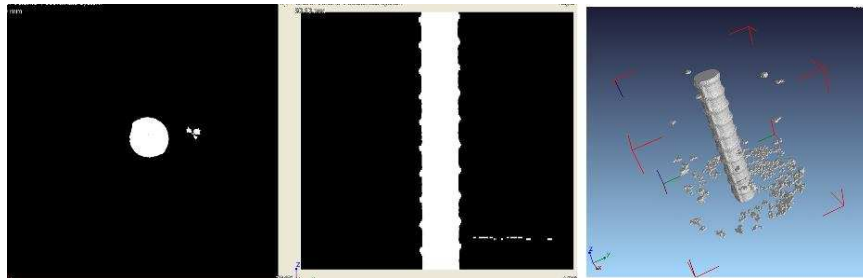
Internal Cracking at Load Level 2400 lbs
